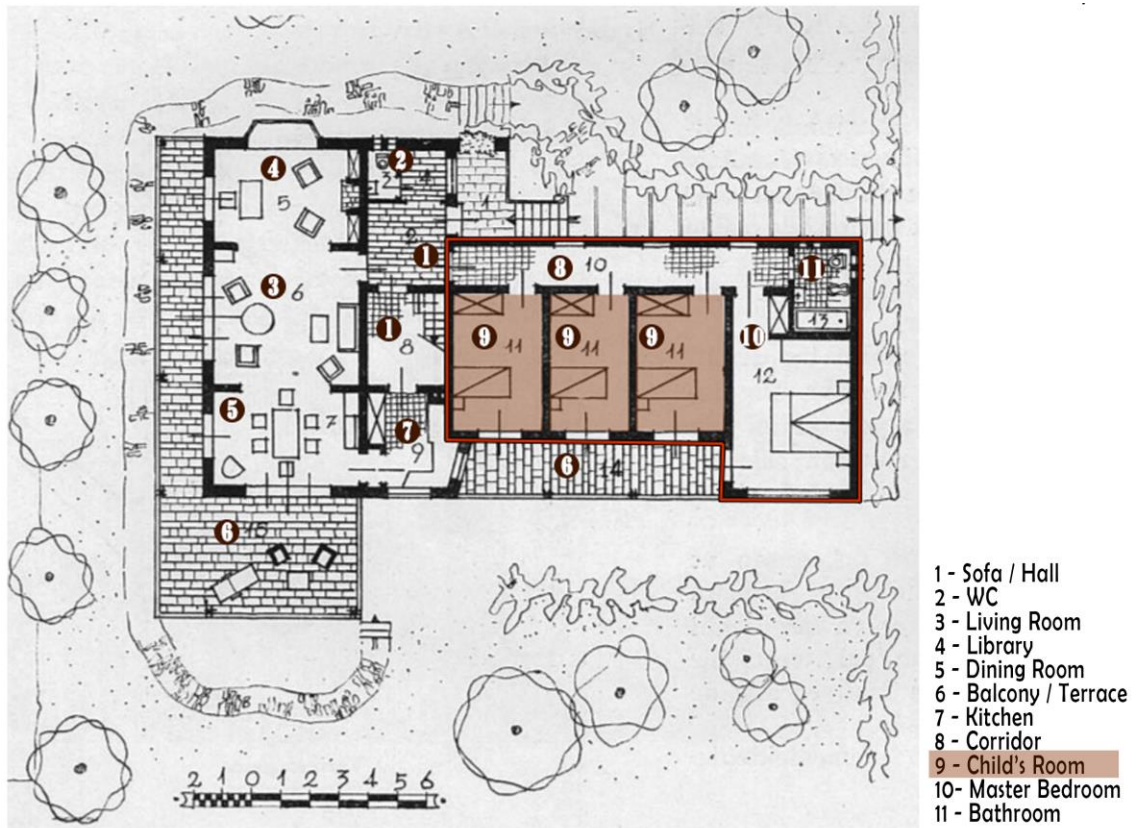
The ground floor plan of E. Elagöz House in Ortaköy, İstanbul (Arkitekt, 1947, 7-8)
